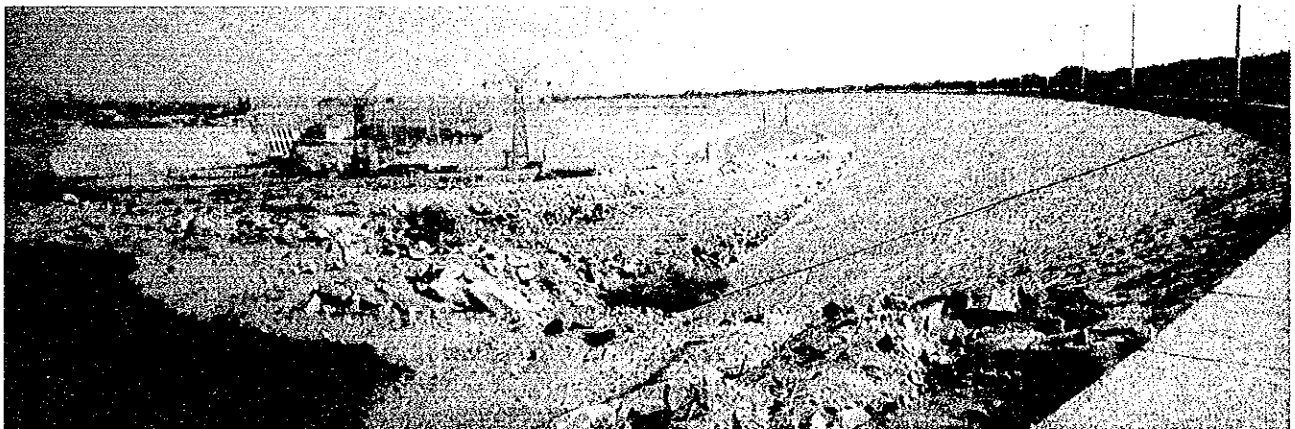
Overall view of Aswan High Dam (downstream area)
